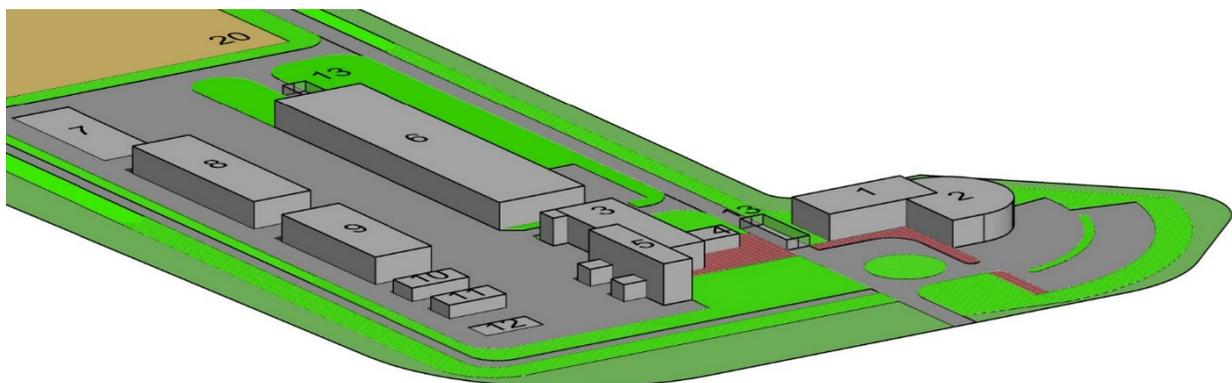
Buildings at the disposal site: 1) Office building 2) Visitor centre, 3) Operation building, 4) Guard, 5) Ventilation building, 6) Tunnel portal building, 7) Packaging plant area, 8) Waste reception building, 9) Maintenance and storage hall, 10) Research building, 11) Backup power supply, 12) Refuelling station, 13) Control, 20) Storage/construction area (also for container laydown purposes). Figure by AINS.
